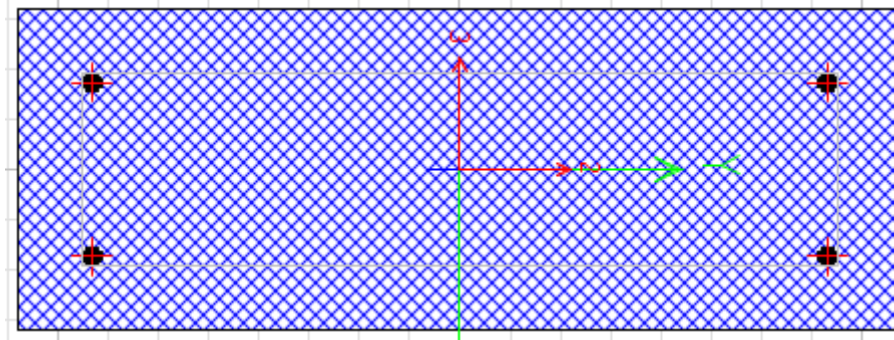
Cross section detail for the NBR 6118 (2014). (Computers and Structures, 2016).
